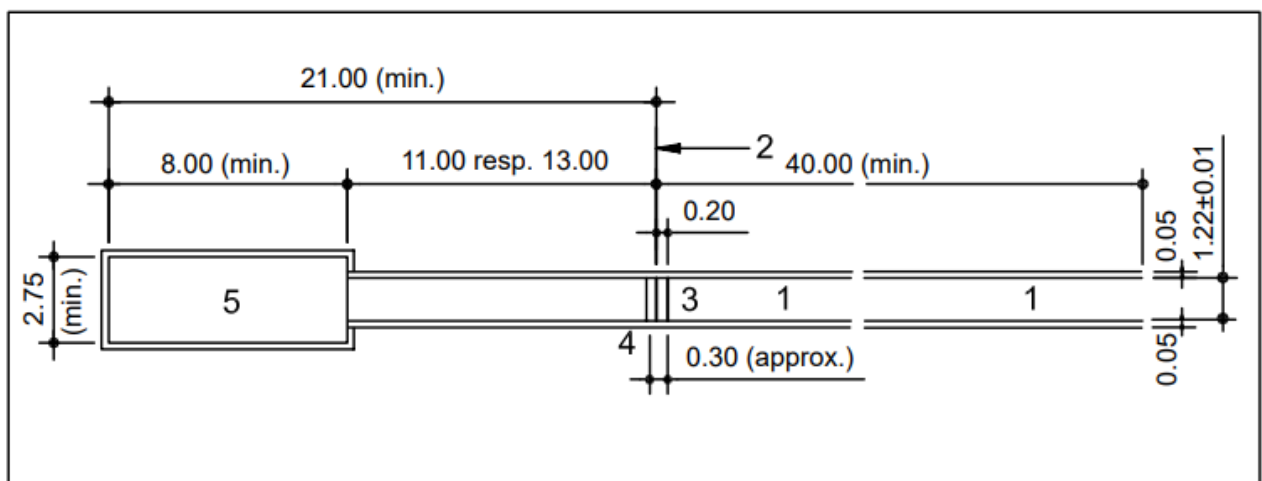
Triple Jump facility (Dimensions in m)
